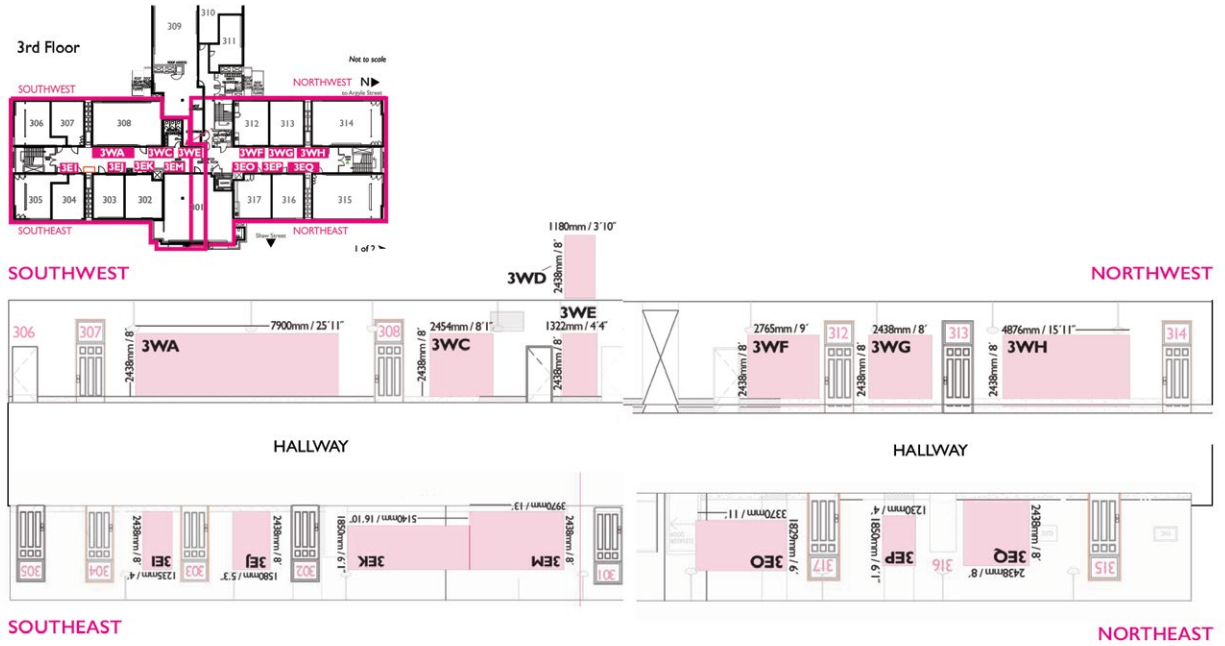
Artscape Youngplace Third Floor Hallway Gallery Floorplan.
